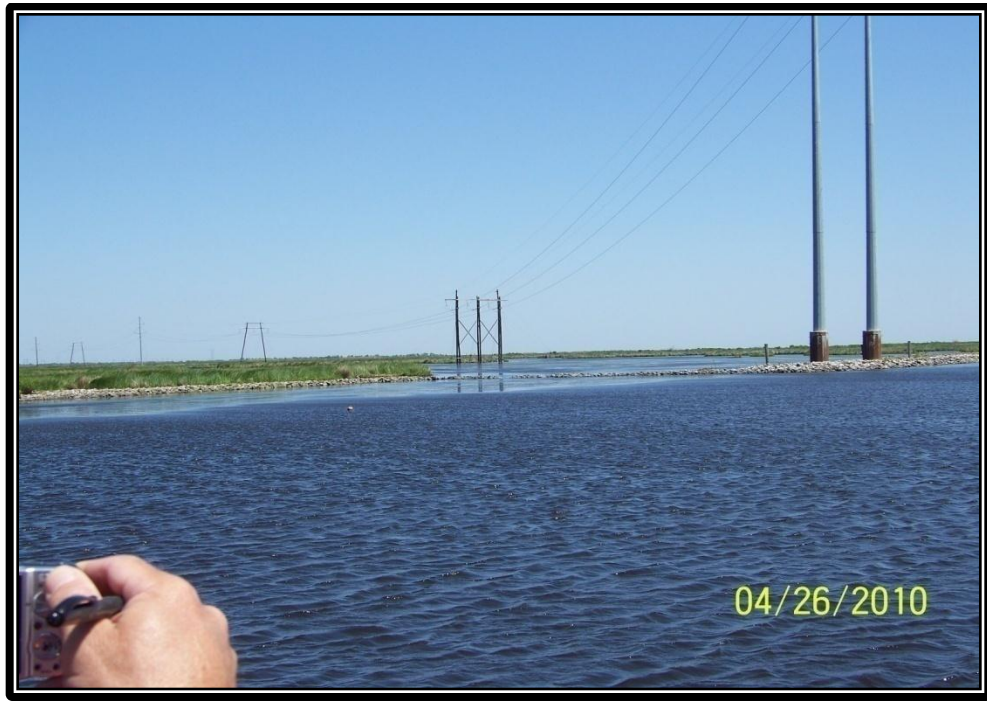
view of rock shoreline along the north bank of Breton Canal.
